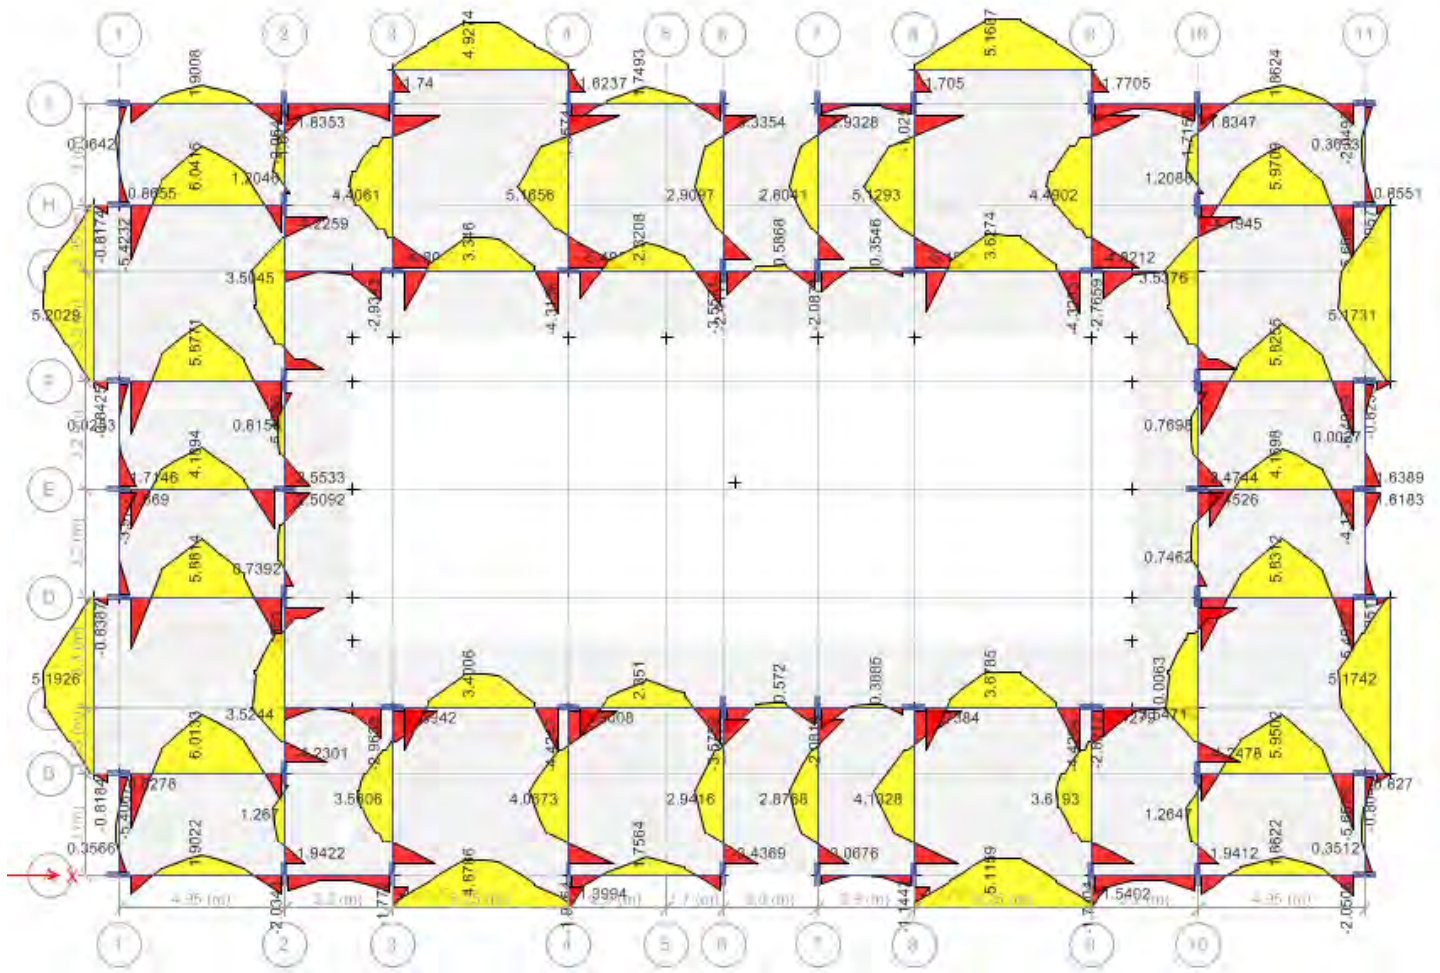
2nd Floor Beam Moment diagram (M3-t.m)
